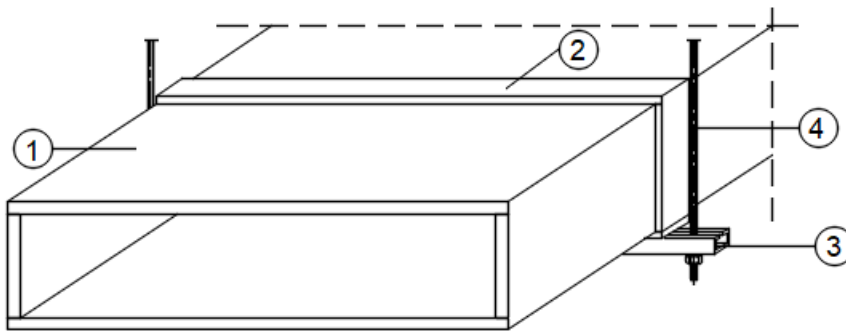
Self-supporting horizontal smoke extraction ducts PROMADUCT®-LT with maximum cross-section dimensions of 1250 mm x 1000 mm
